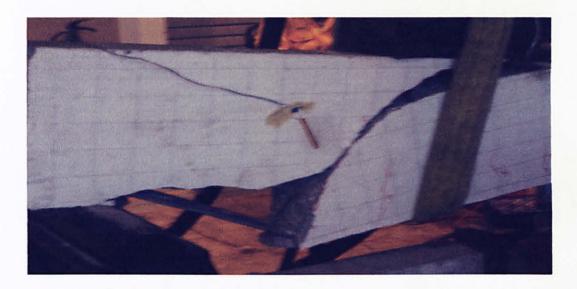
Failure of control beam at support by shear failure. Bottom Reinforcement Bar (Y12) bent.
